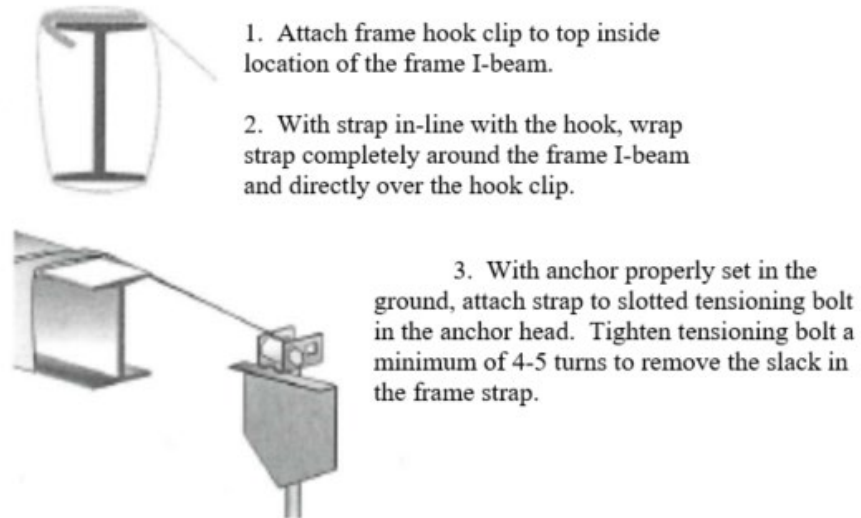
Installing Frame Tie Strap Using a Hook Clip
